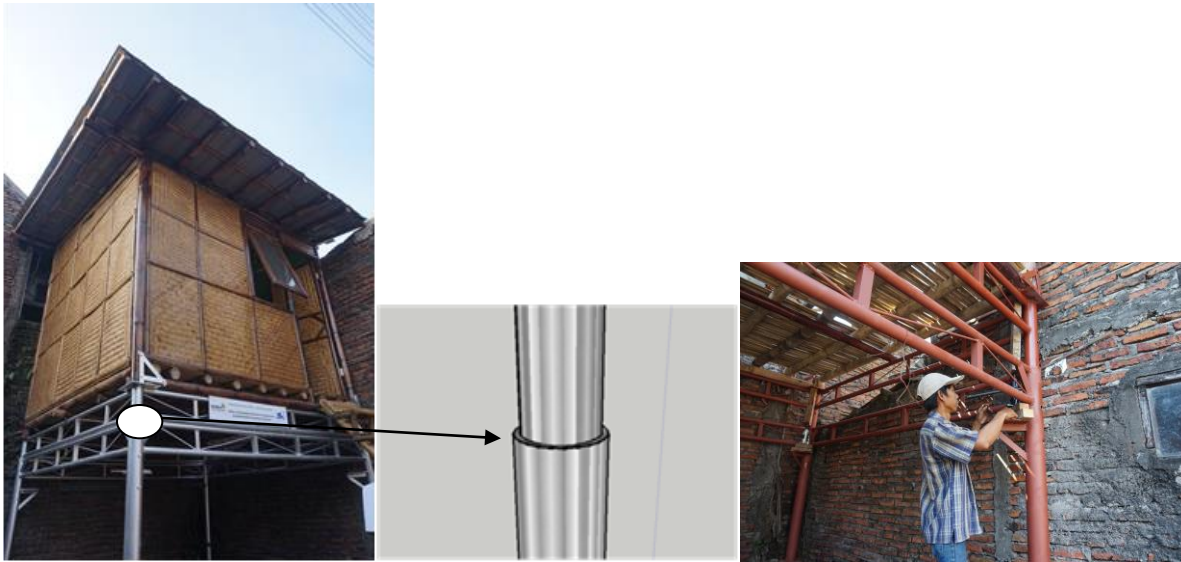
A stage house as a research result that can be raised with a hydraulic system. The design was built on the land owned by Mr. Heriyanto (a resident of RT 02, RW 04 Kemijen Village) which was always flooded
